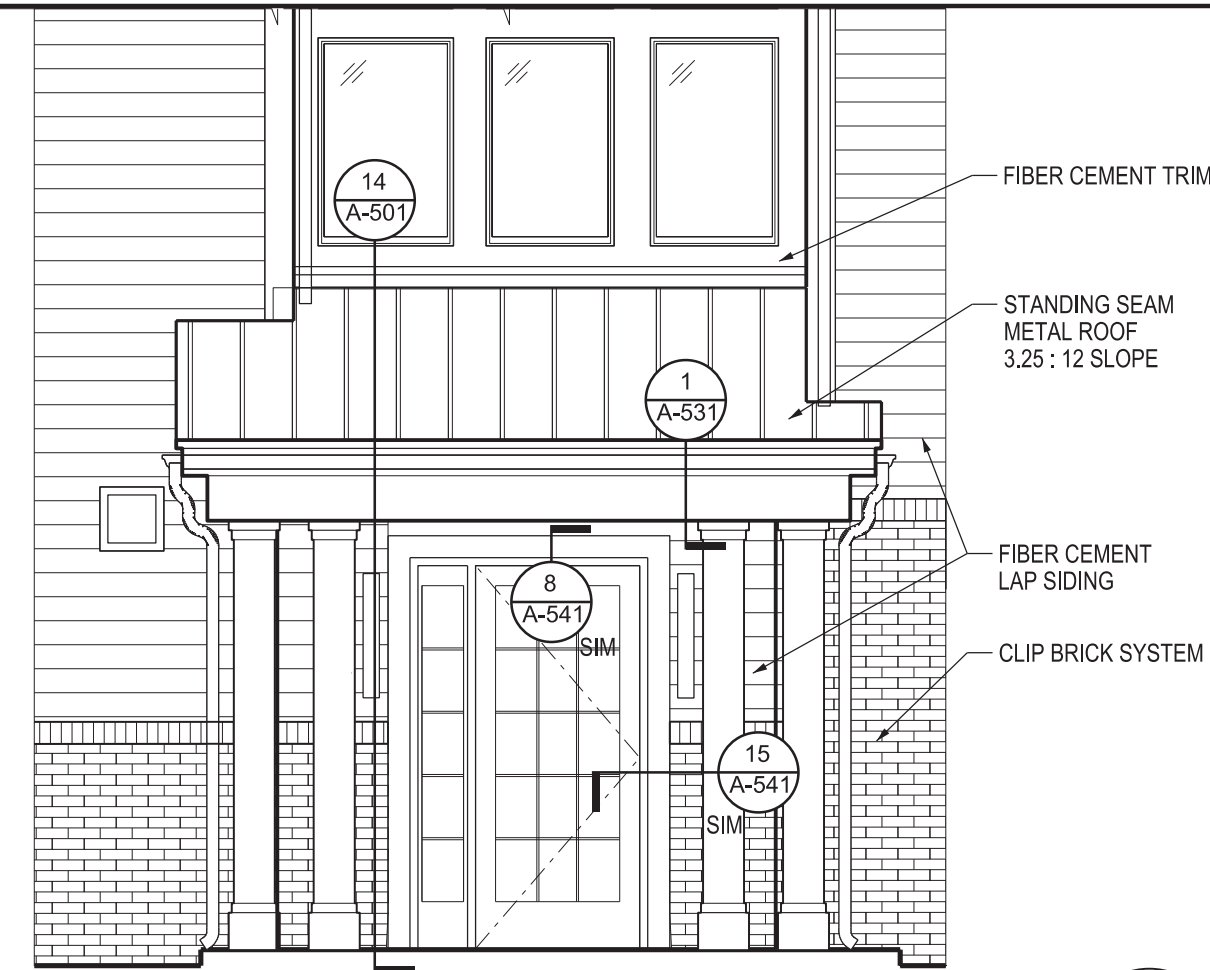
EXHIBIT E - ARCHITECTURAL RENDERINGS - TYPICAL REAR ELEVATION
